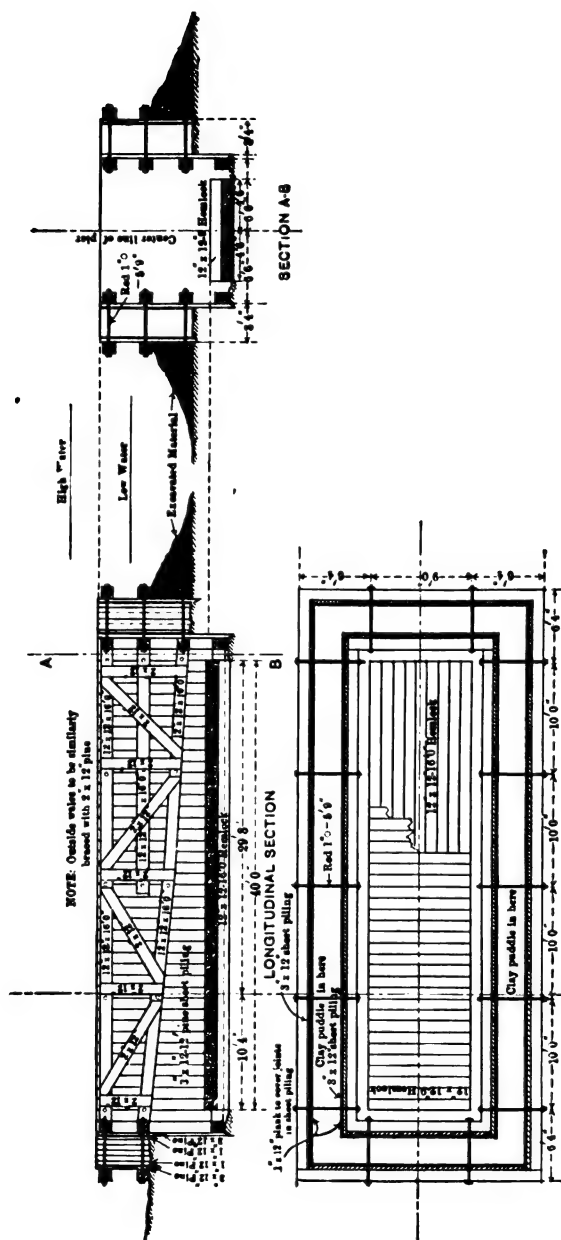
COFFER-DAM FOR ANN ARBOR BRIDGE. MICHIGAN CENTRAL RAILWAY.
